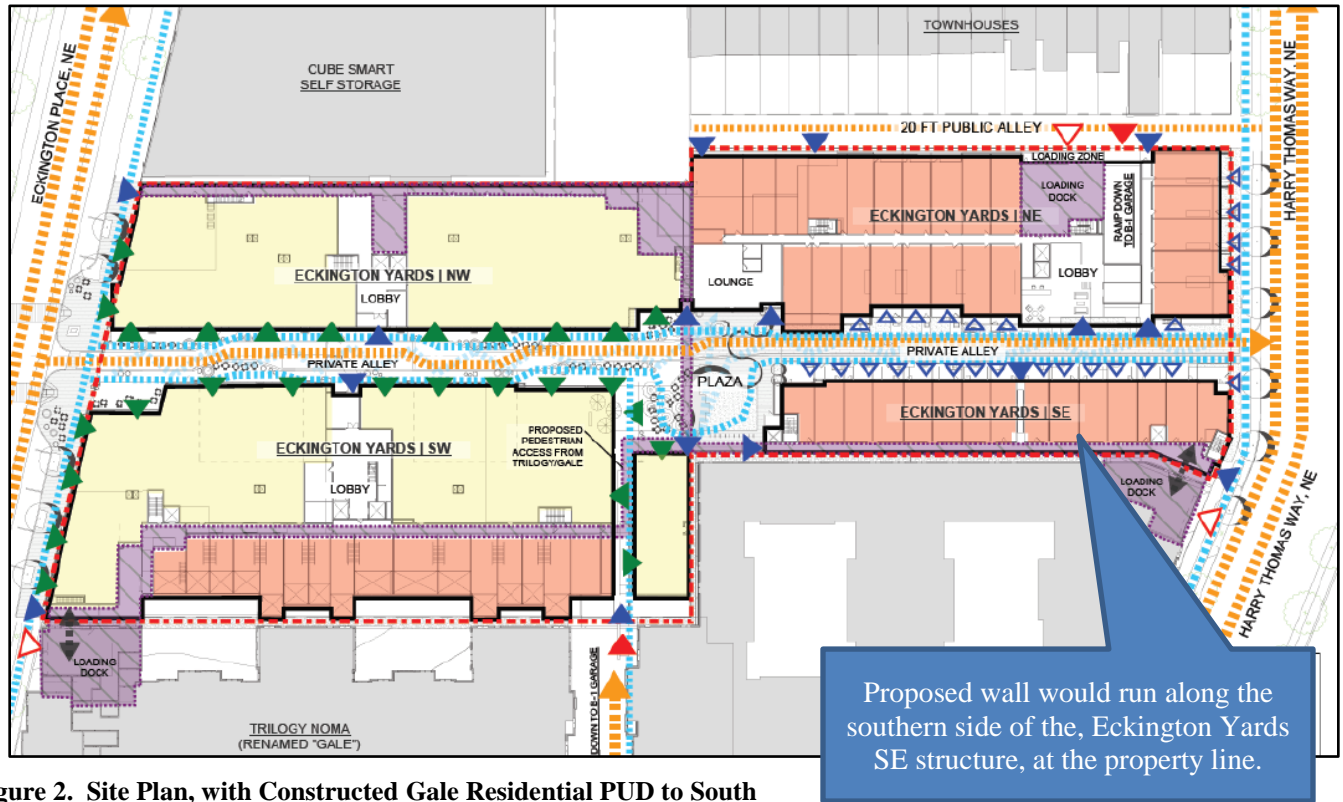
Site Plan, with Constructed Gale Residential PUD to South
